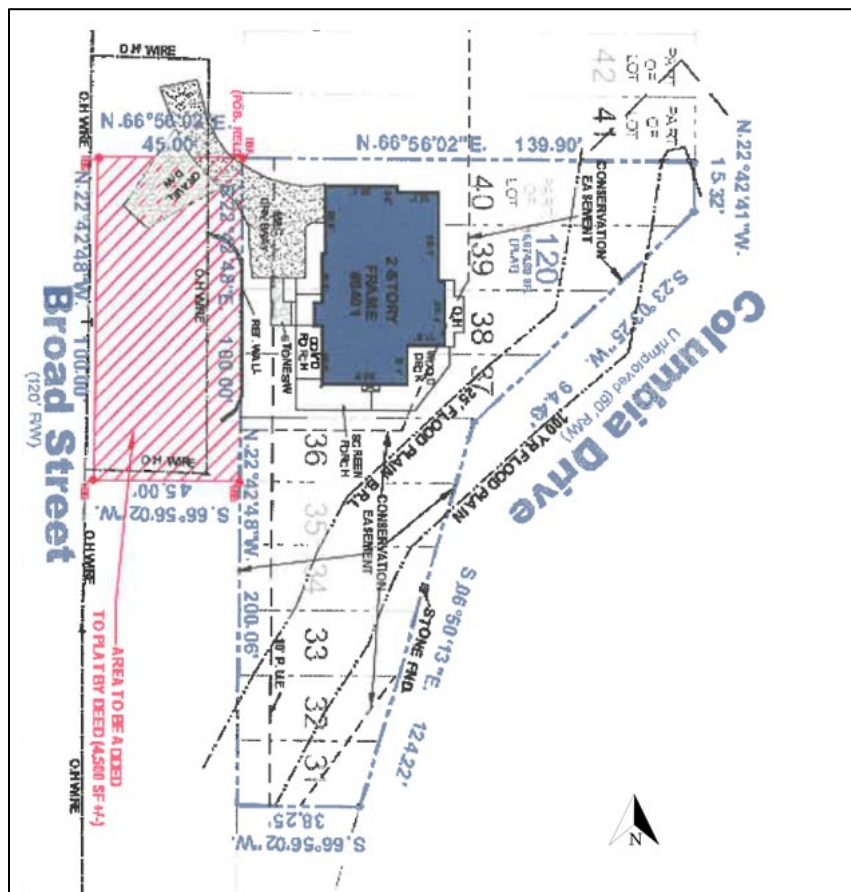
Subject Right-of-Way Abandonment Exhibit included in AB-788 Broad Street Application
